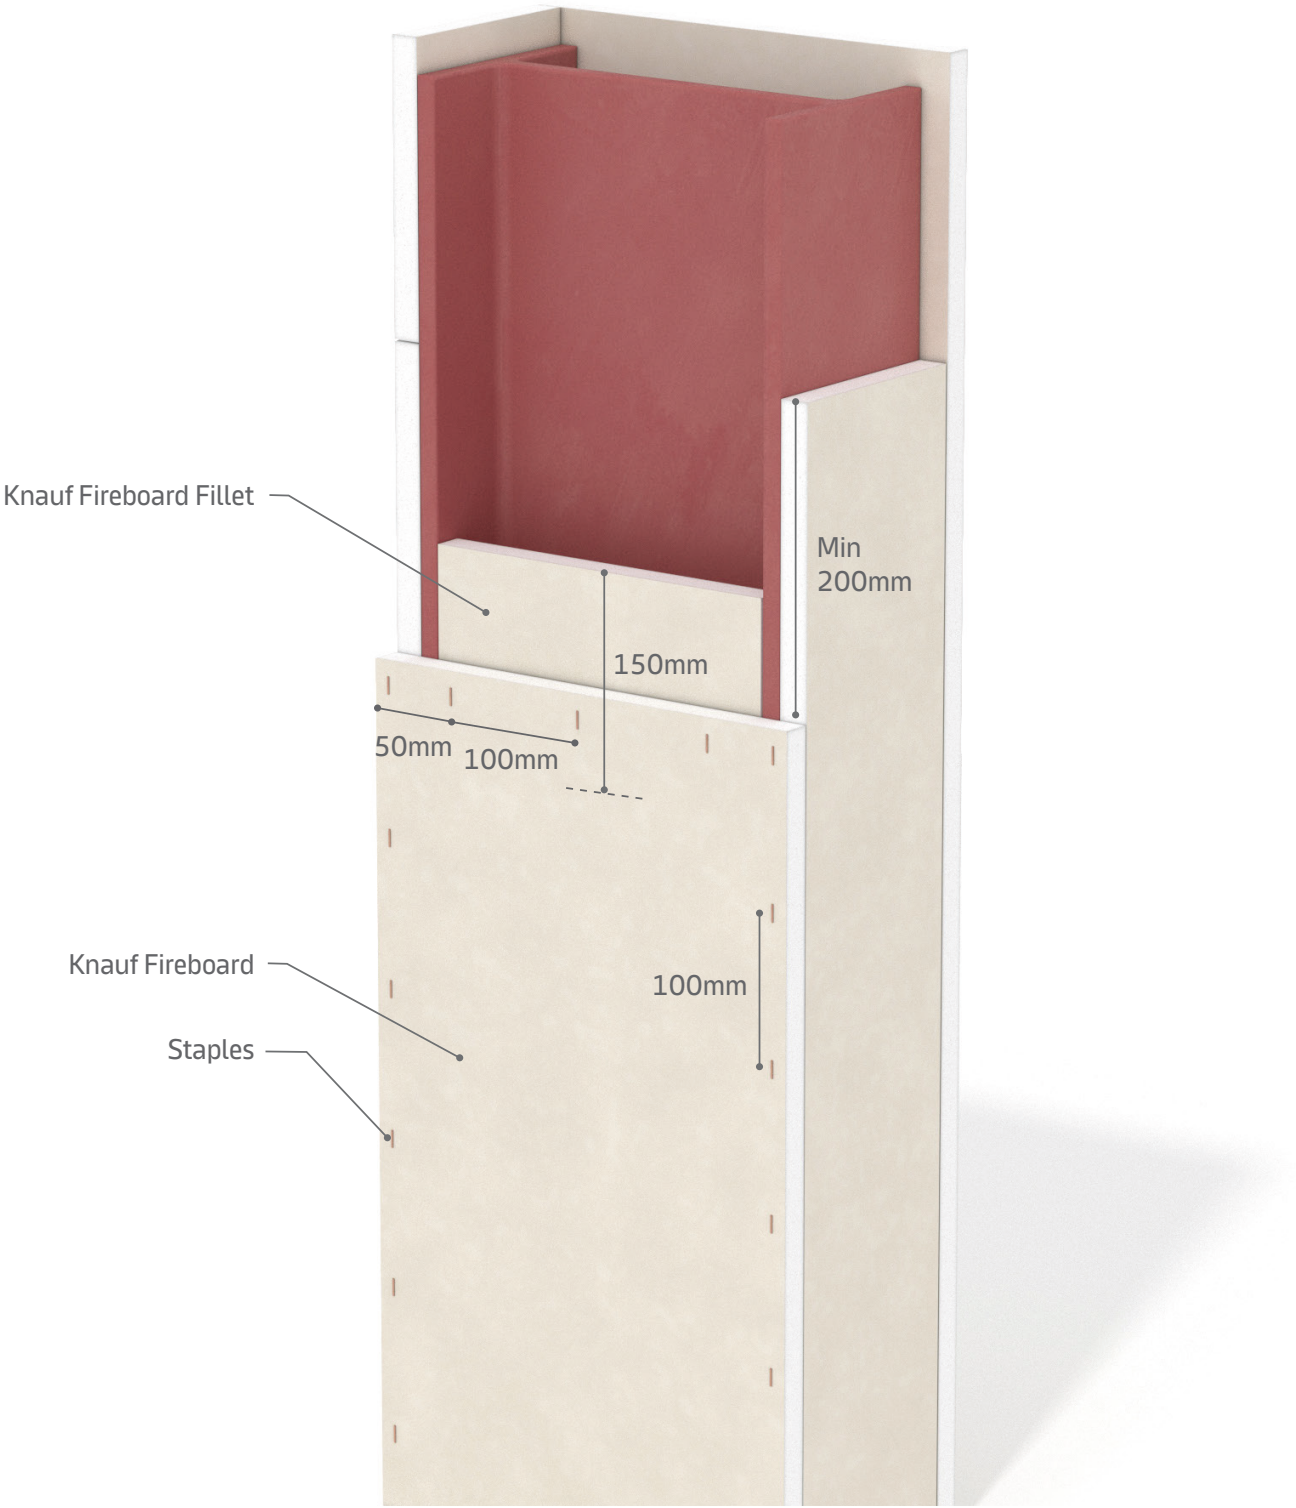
Isometric view of a 4-sided, single layer of Knauf Fireboard protecting Universal Steel Column
